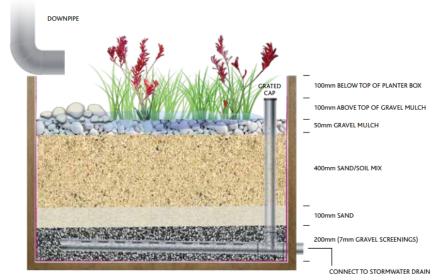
Typical Raingarden Cross section (Source: Melbourne Water 2013)
